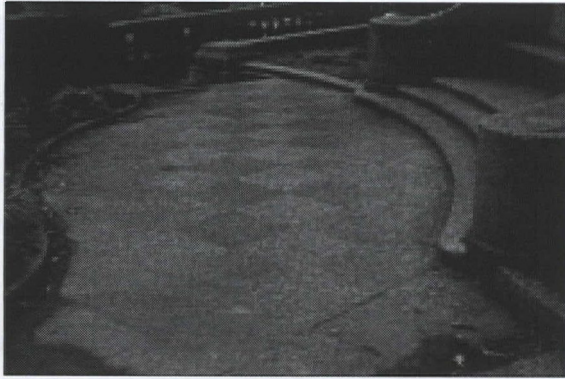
The landing at the southeast entrance to the park features crushed grey stone with beige in a checker-board pattern, 1997, see plan sheet 30 (Land Ethics, Inc.)
